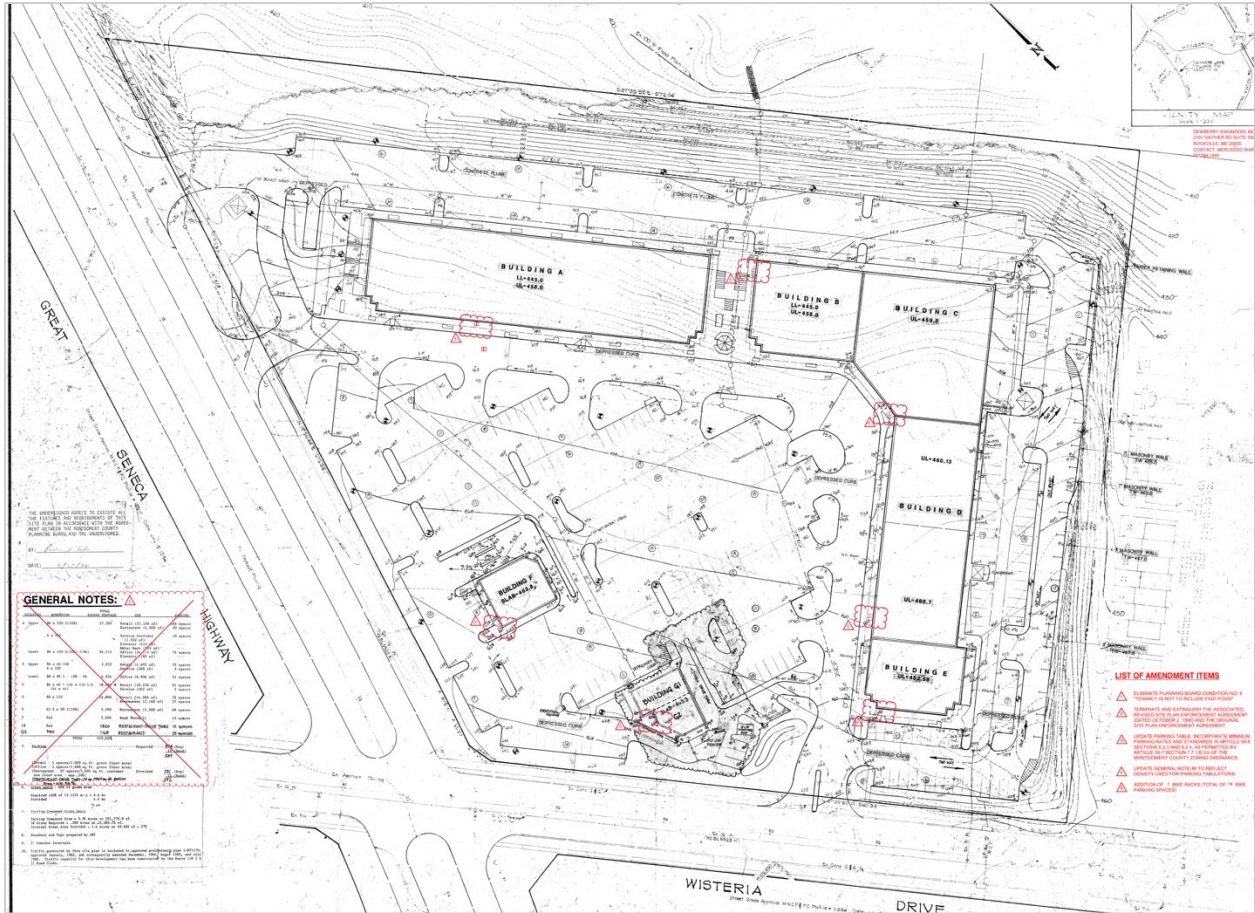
Proposed site plan amendment with approximate location of new bicycle parking shown
